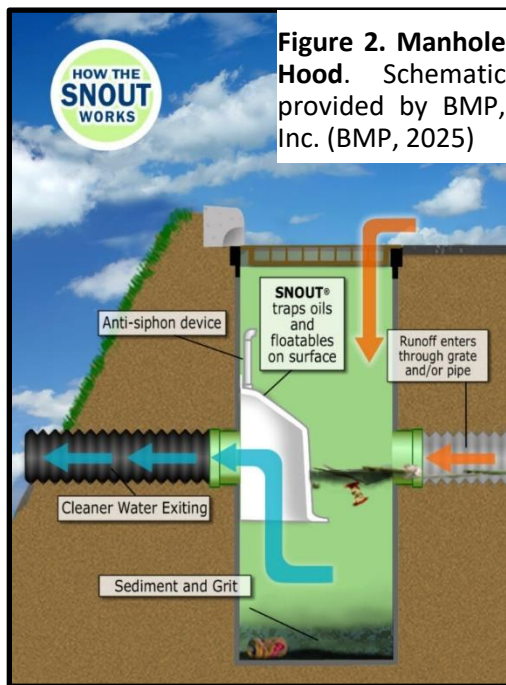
Manhole Hood. Schematic provided by BMP, Inc. (BMP, 2025)
